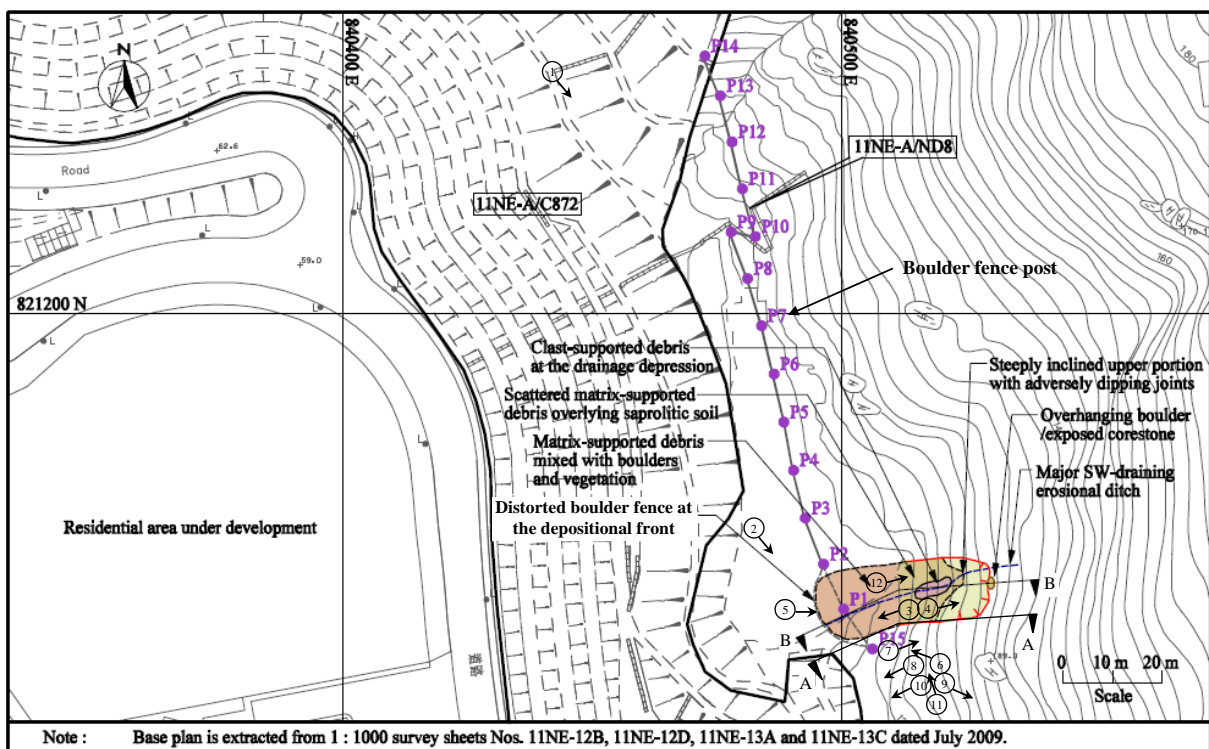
Locations of the Landslide Site and Flexible Rockfall Barrier No. 11NE-A/ND8
